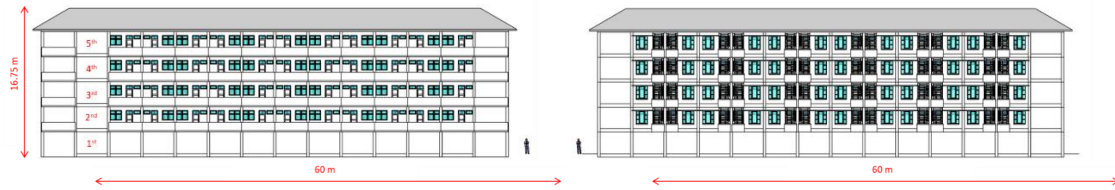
(a) Left - Corridor facing elevation; (b) Right - Outdoor facing elevation.
